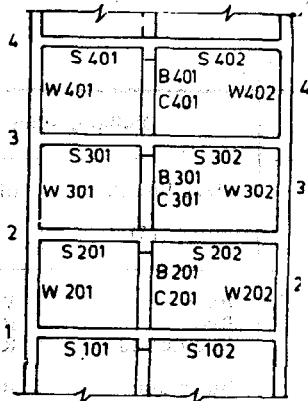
EXAMPLES OF DESIGNATION FOR COLUMNS, FLOORS, WALLS AND BEAMS
